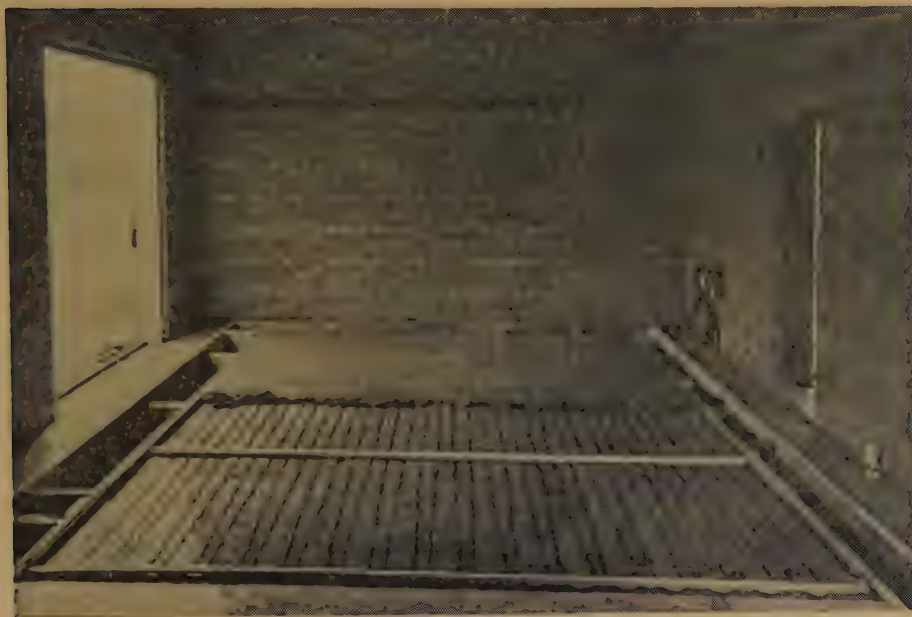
Typical arrangement of a solidly-embedded floor-warming installation.
